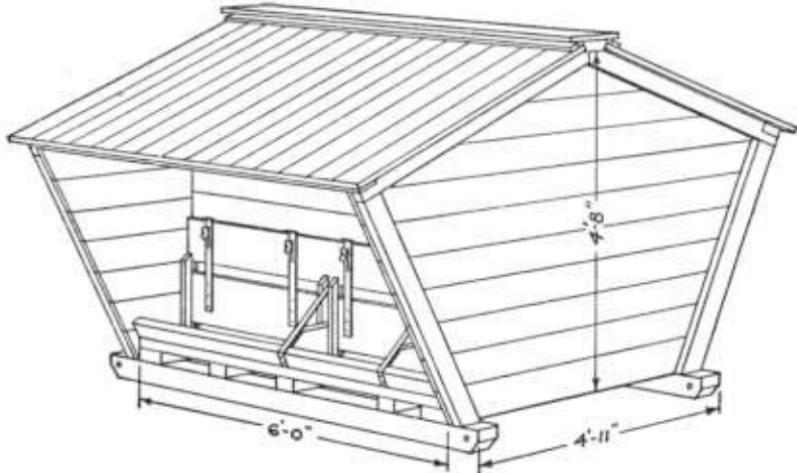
Detailed plan for construction of self-feeder. (Design No. 1636)
